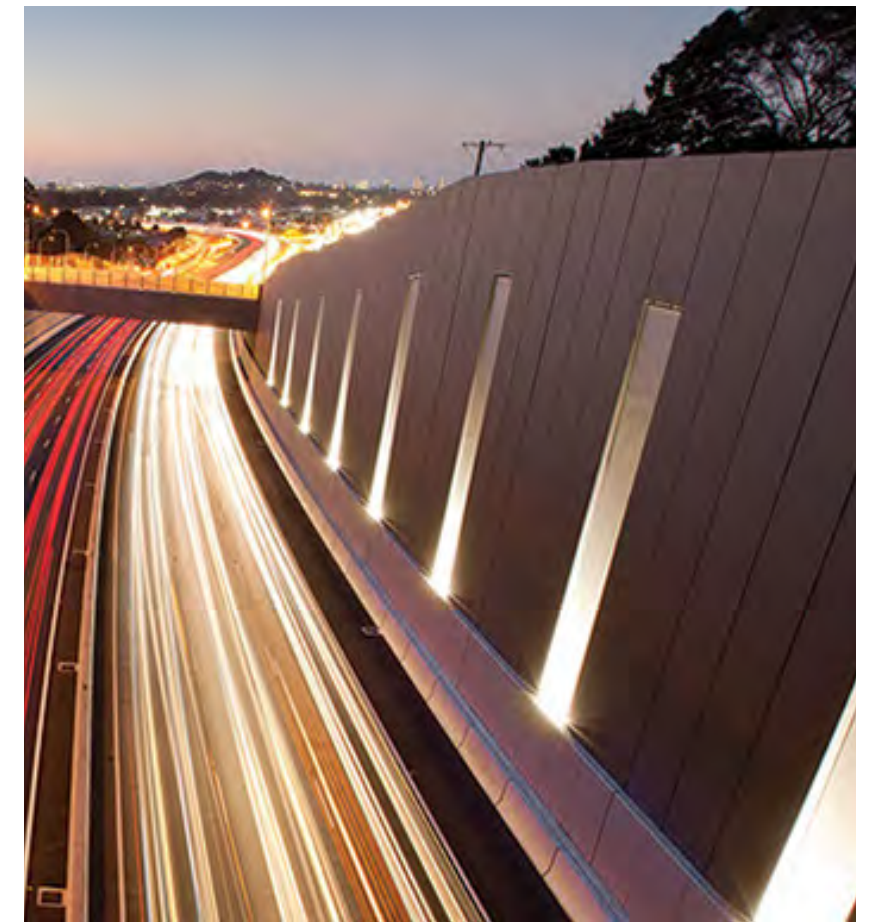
Lighting is a striking addition to these retaining walls at the Banora Point Bypass
